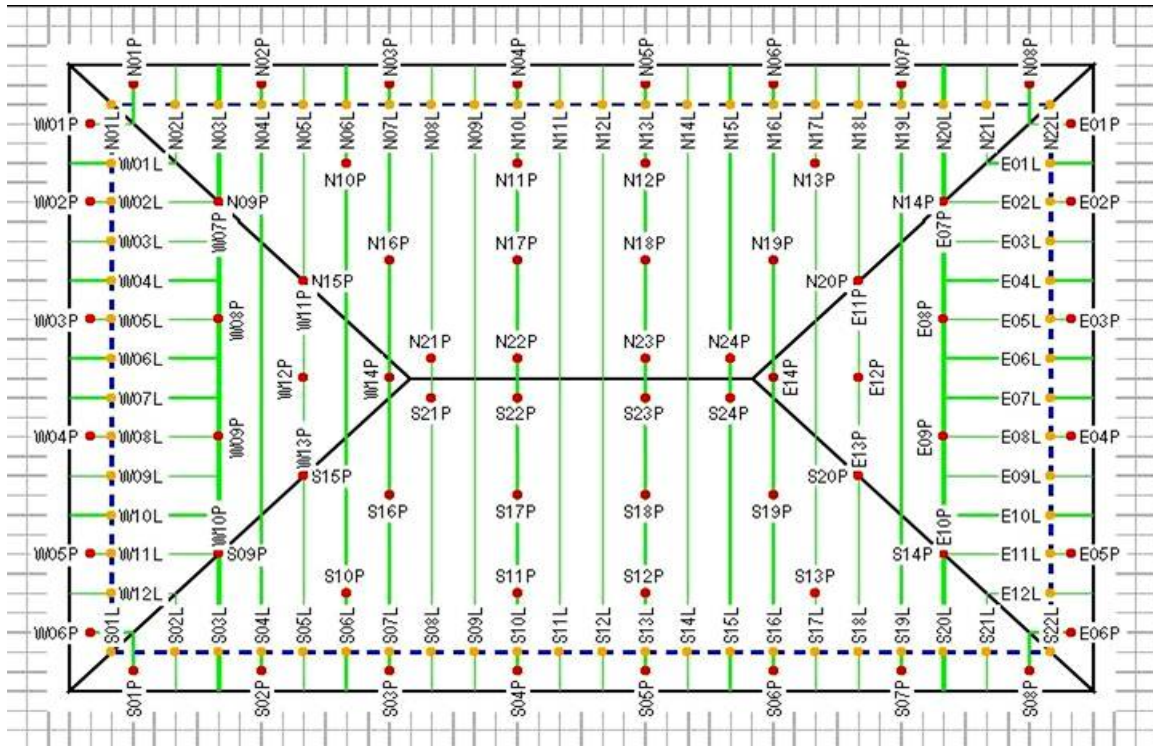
Plan view of hip roof showing the locations of load cells and pressure cells (FPL, 2006)
